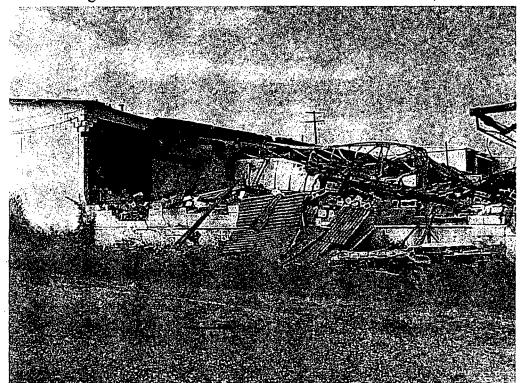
View of partially collapsed/demolished facility structure. View taken facing, $N\omega$
